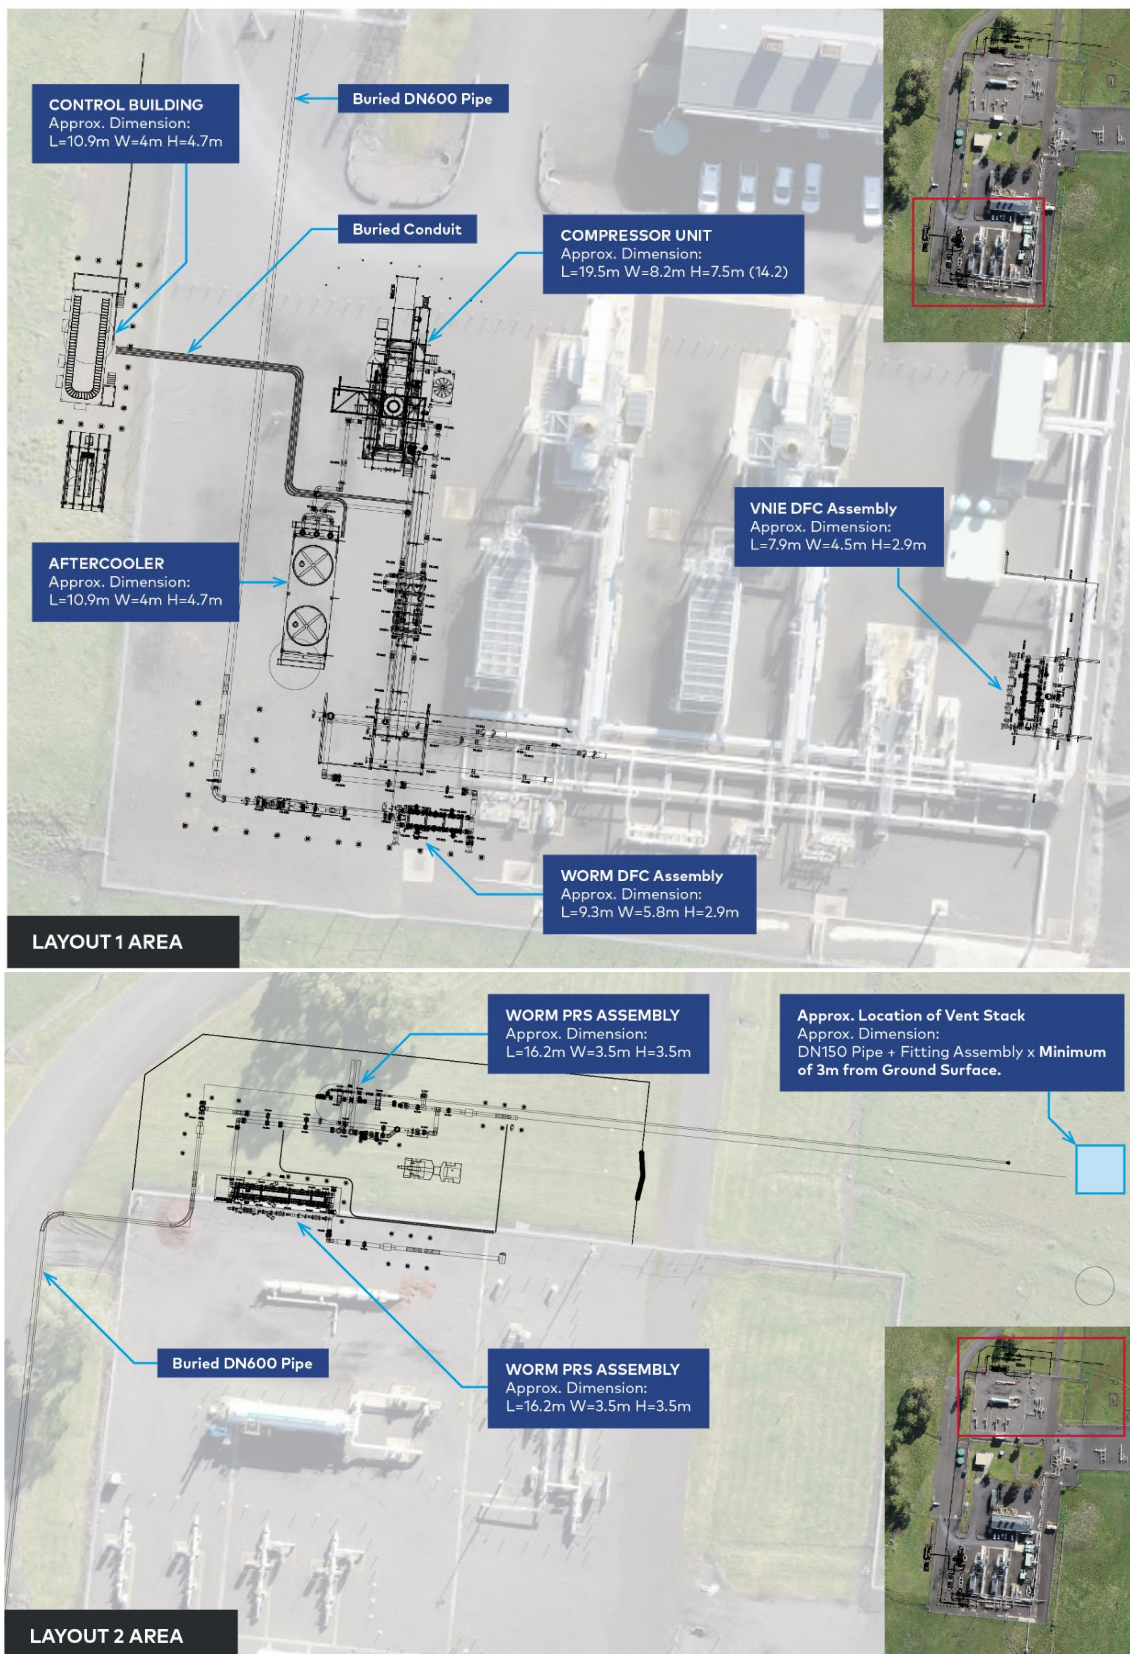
Wollert compressor site and location of proposed additional facilities (Source: project EES).
